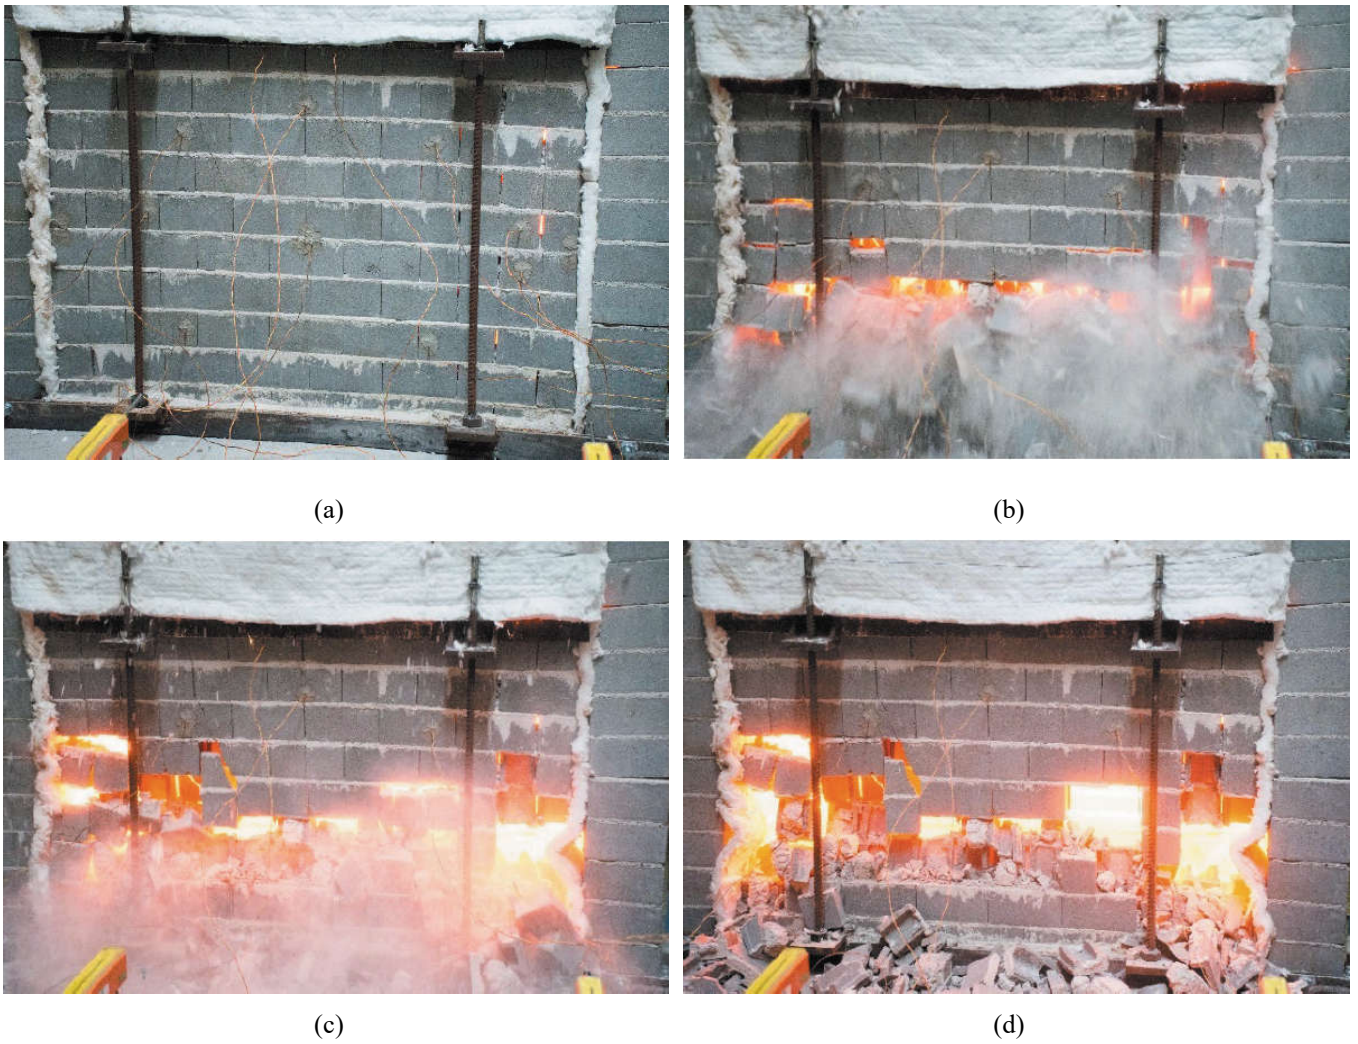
Sequence of the sudden collapse (Specimen 6)
